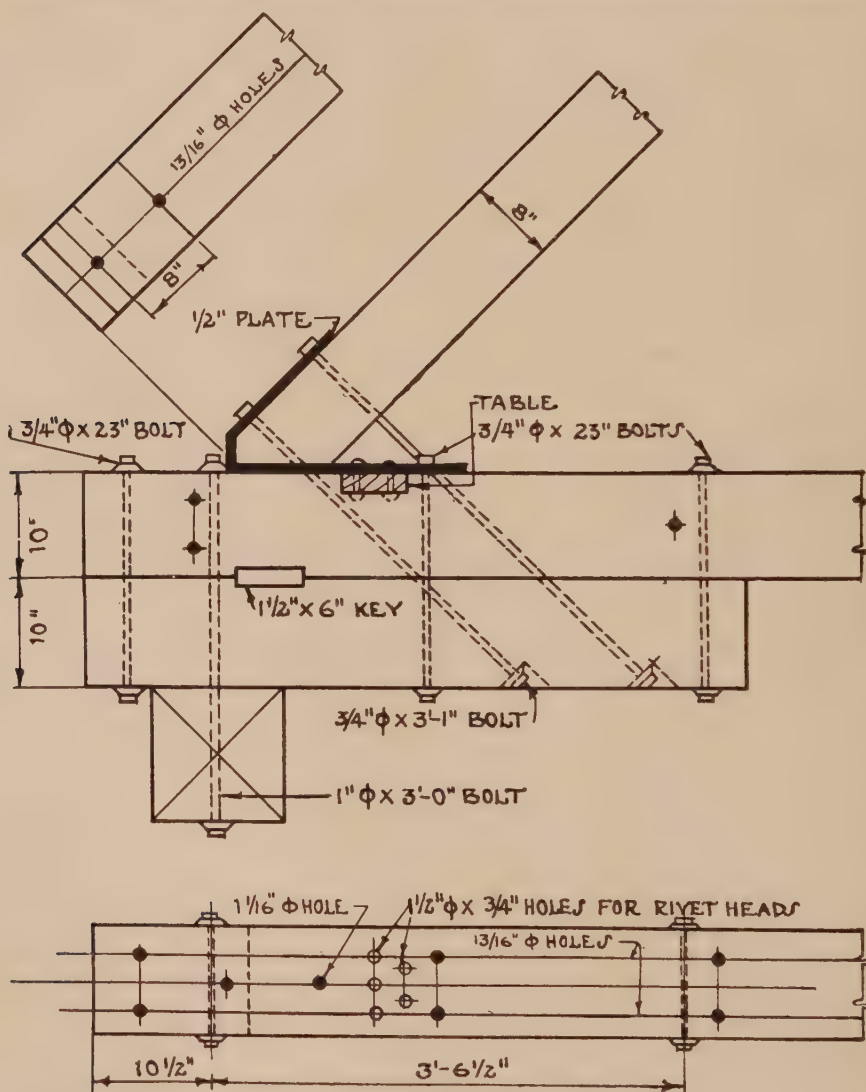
Detail of end joint of a 55-ft. truss, Louisville and Nashville Railroad.
